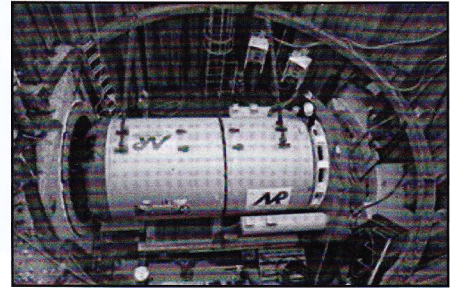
Example of microtunneling boring machine. Photo courtesy of Robbins, Inc.
